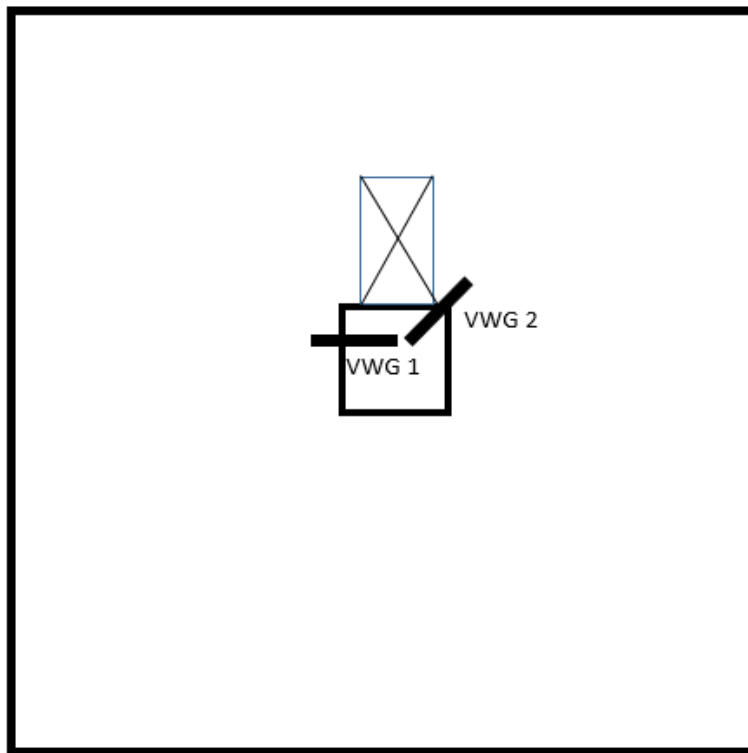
Typical locations of VWG in the tension side for slabs containing opening
